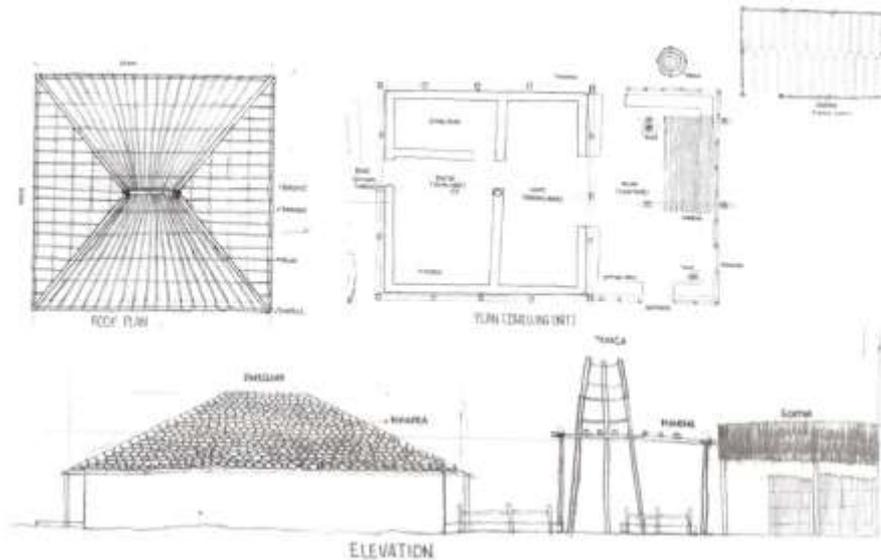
Dwelling unit plan, roof plan and elevation of bhariya tribe at Patalkot
